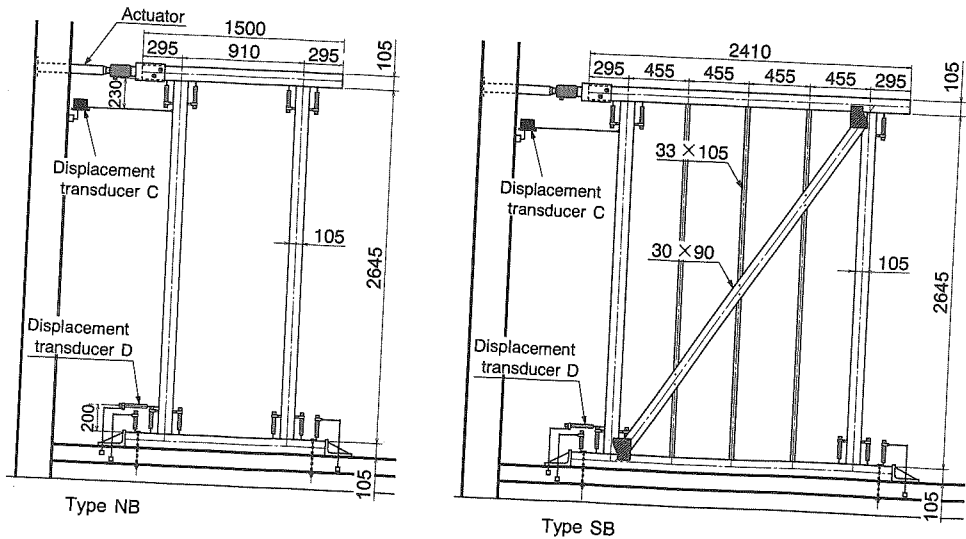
Geometry of frame specimens and setup of racking test (Unit: mm).
